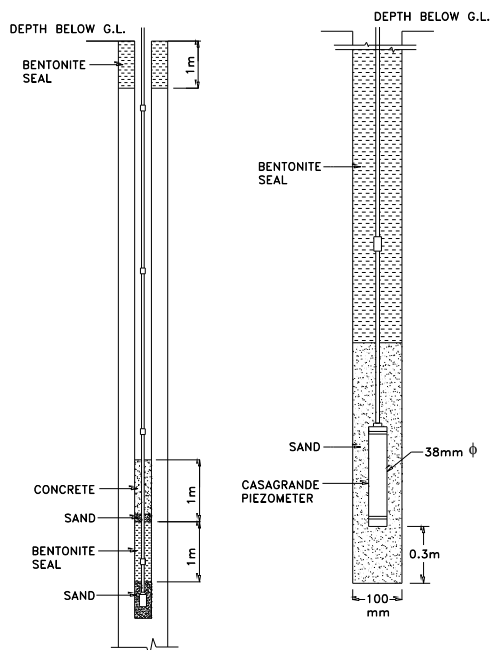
DETAILS OF OPEN STAND PIPE PIEZOMETER (CASAGRANDE TYPE)
